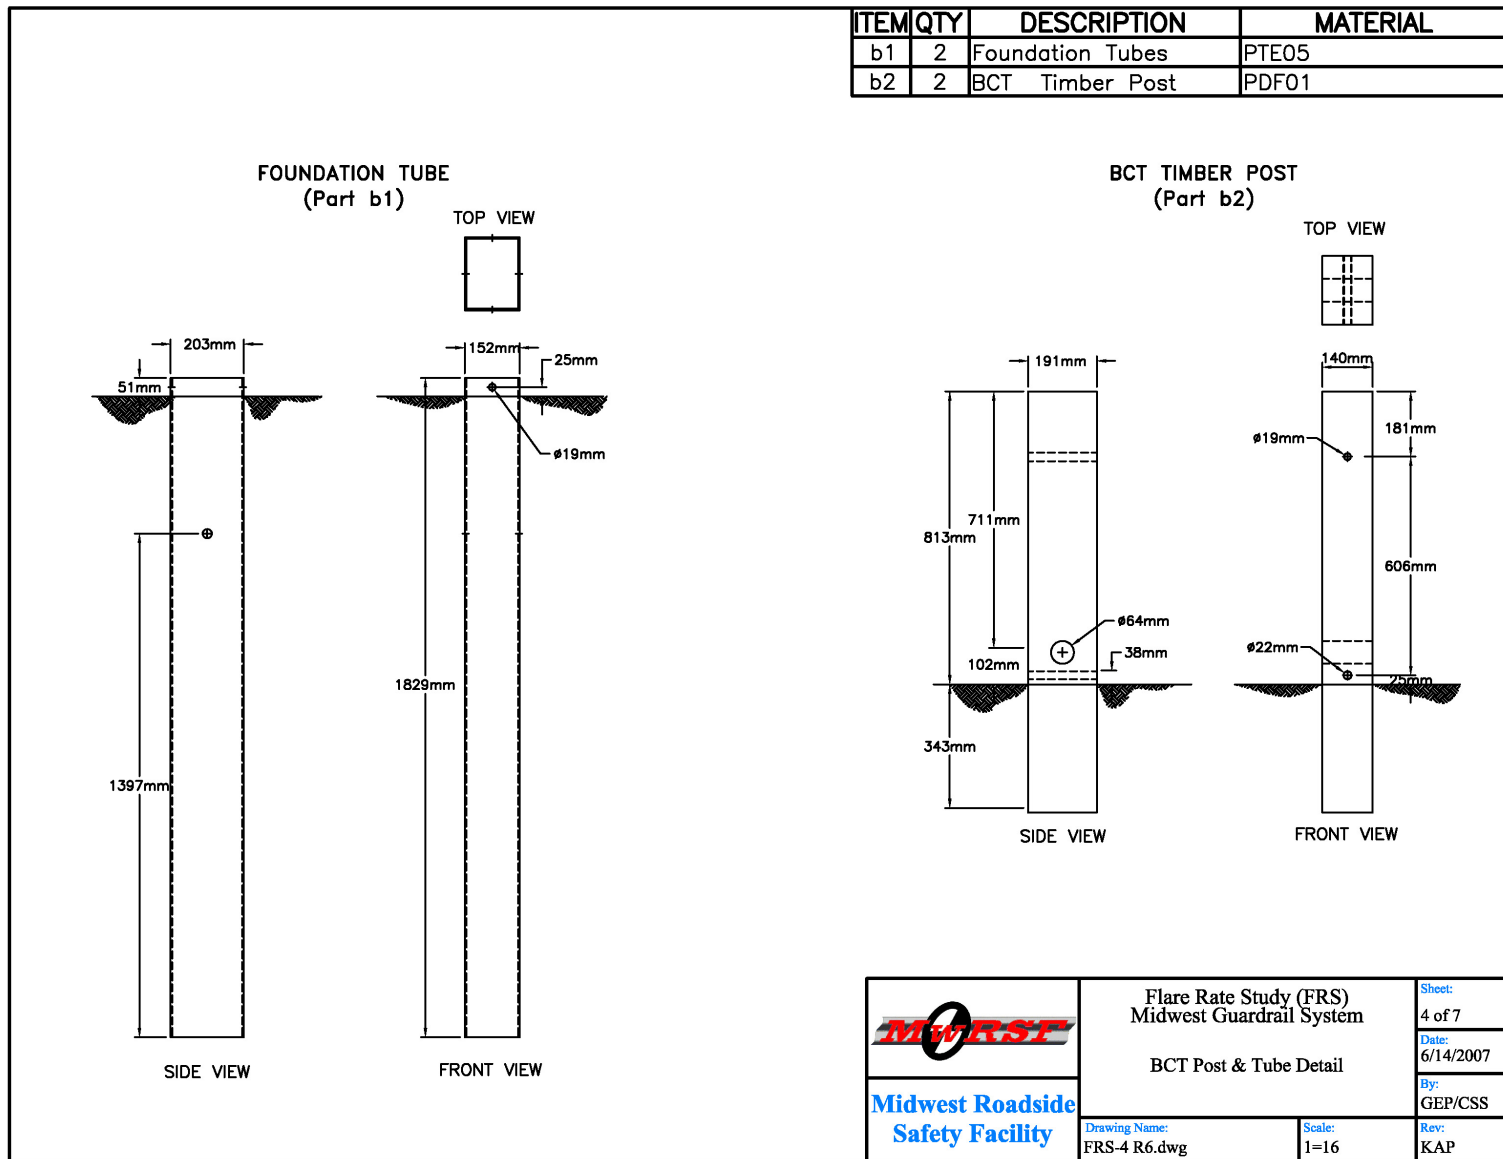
Anchorage Details, Design No. 3 (Metric)
